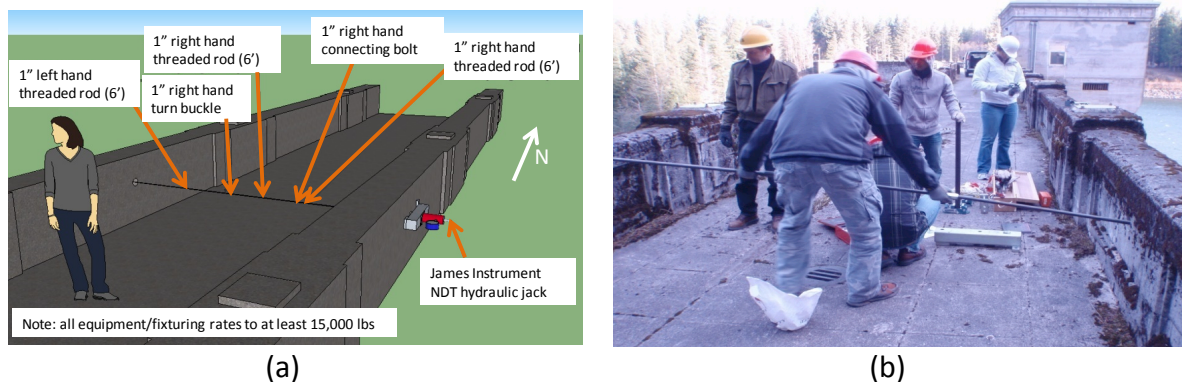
Concrete parapet wall evaluation: (a) testing schematic developed by team and (b) on-site load testing
